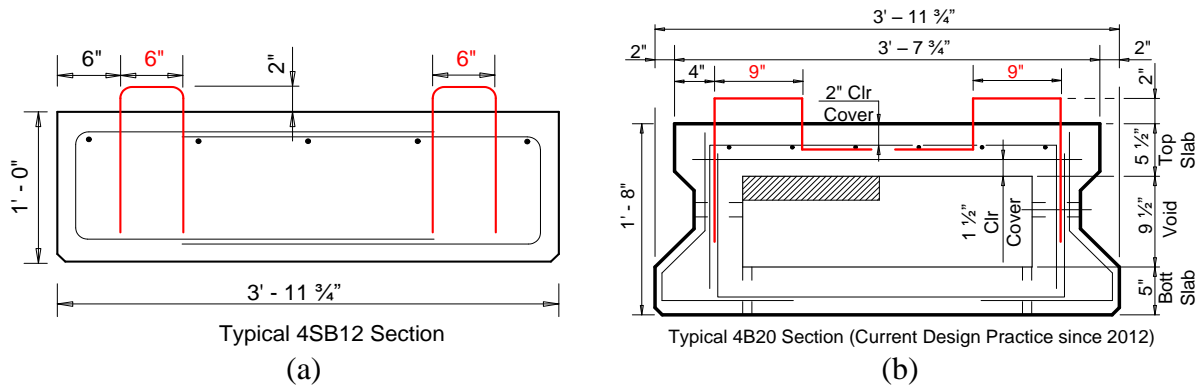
Standard TxDOT (a) slab and (b) box beam details
